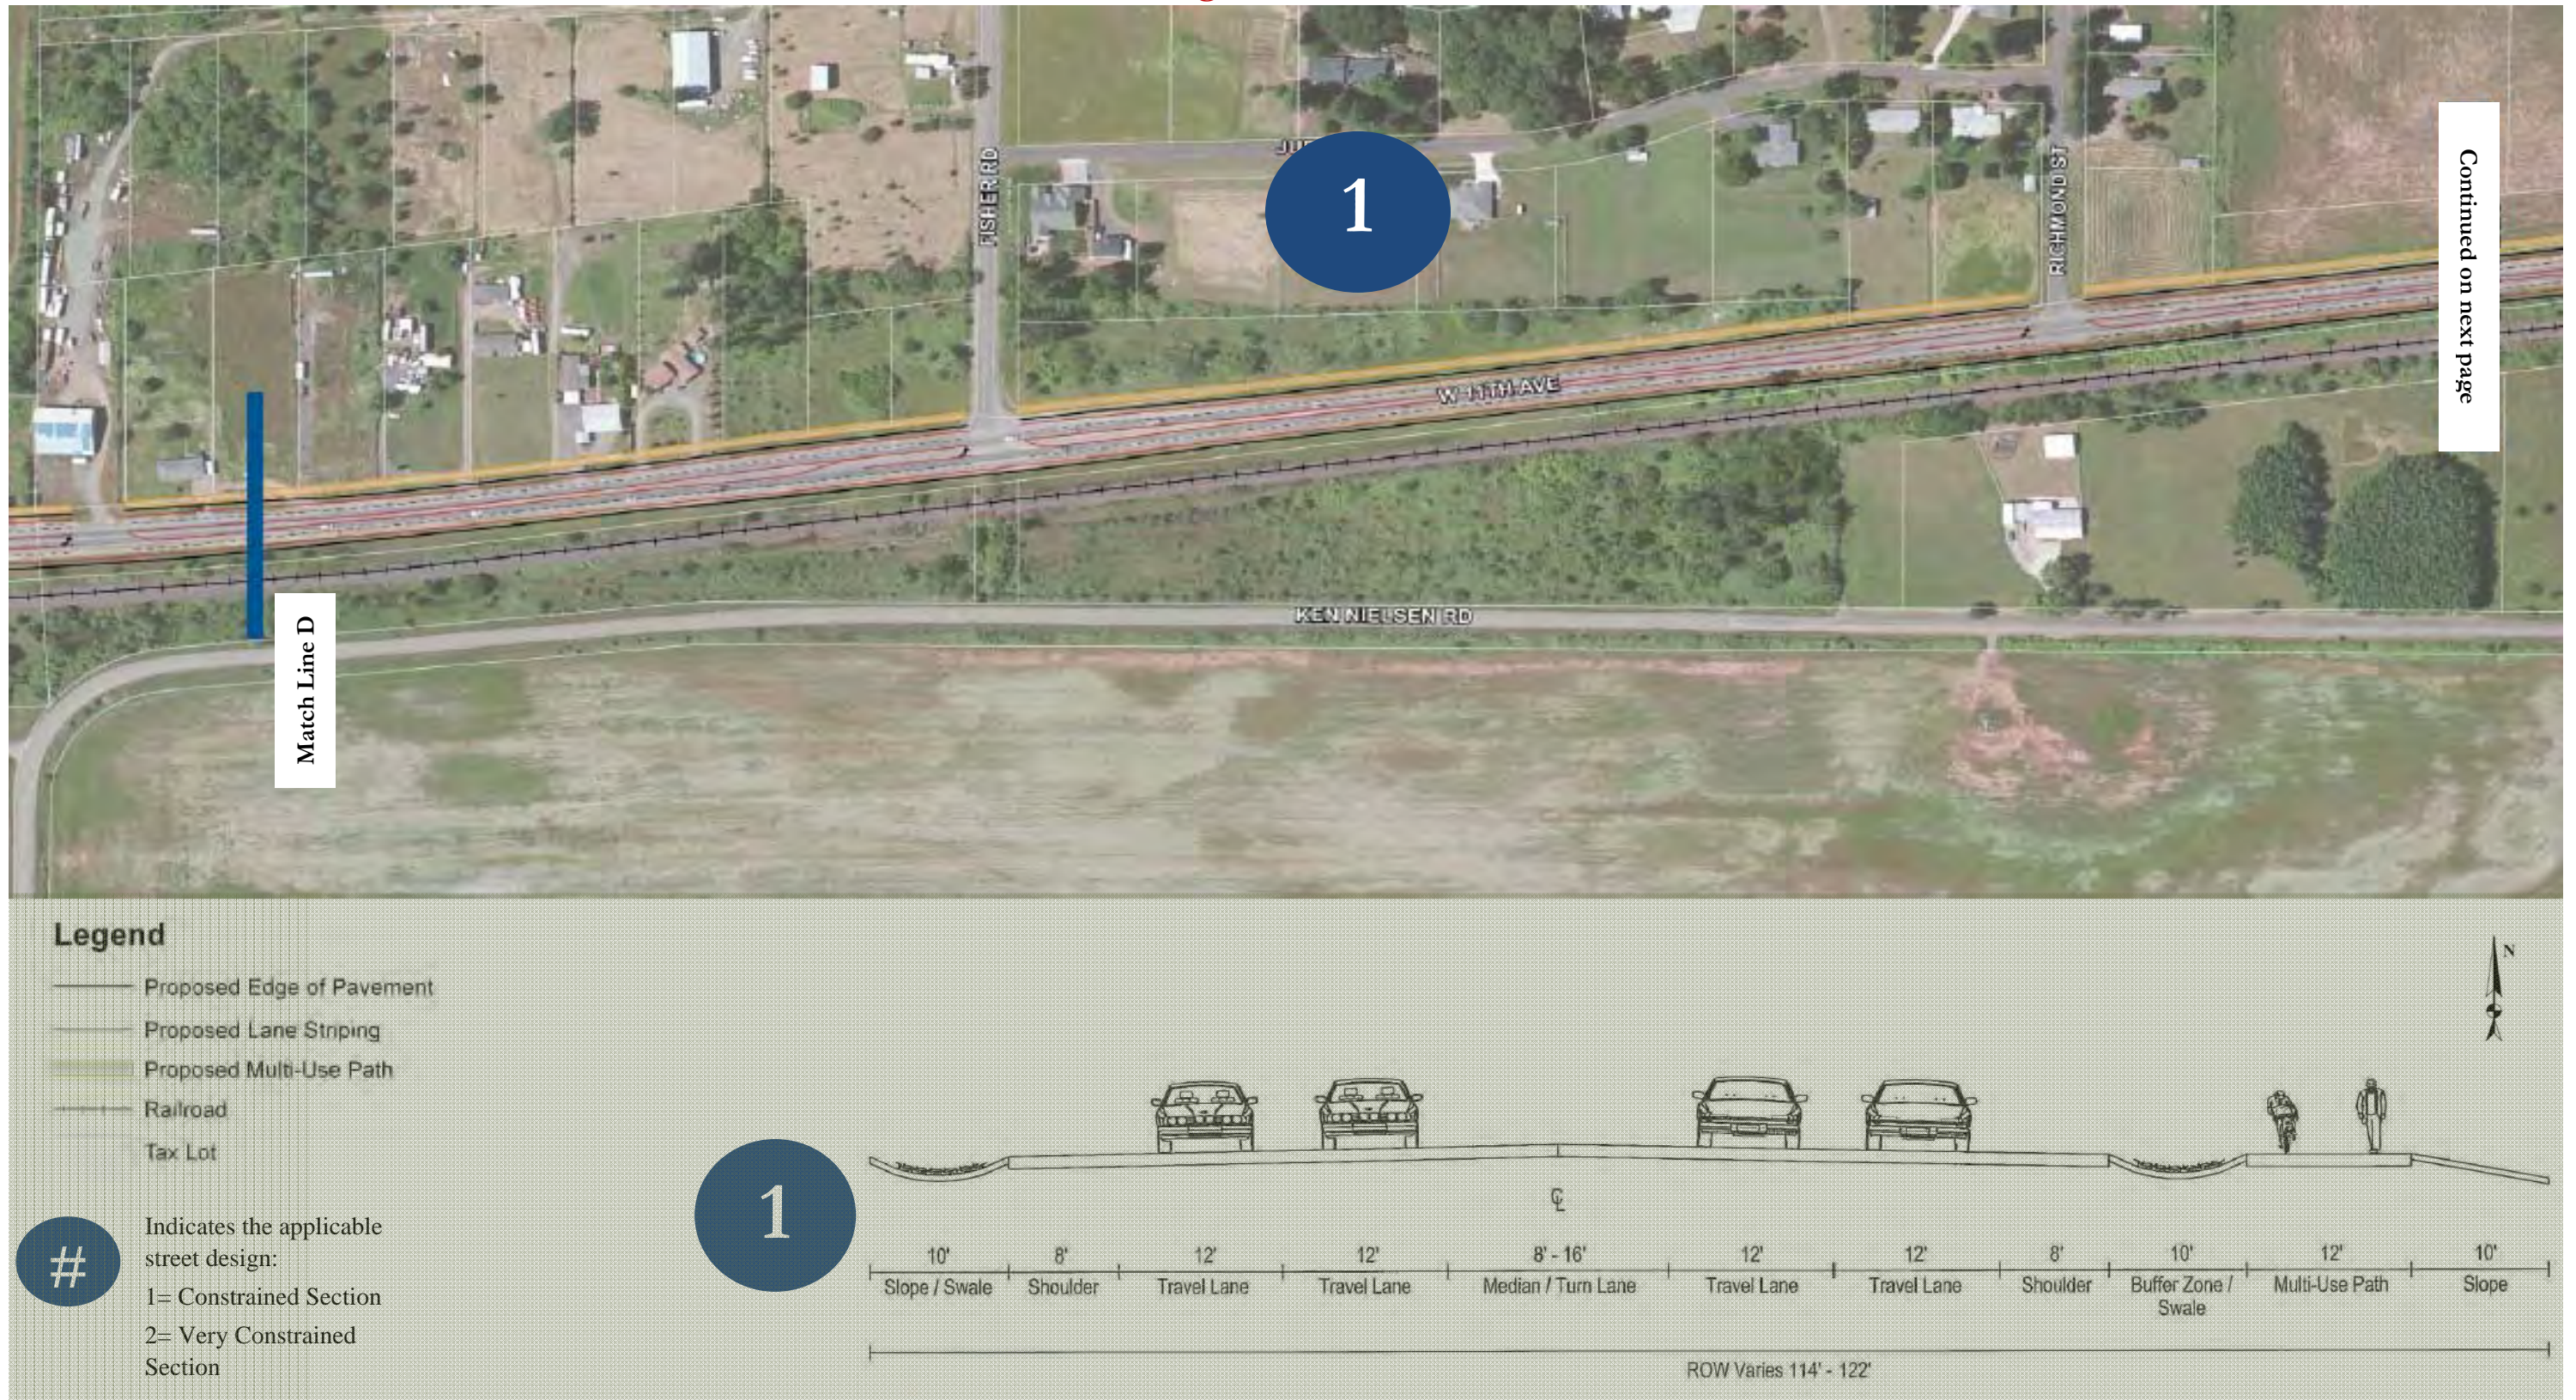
Recommended Corridor Plan: East of Richmond Street to Greenhill Road
